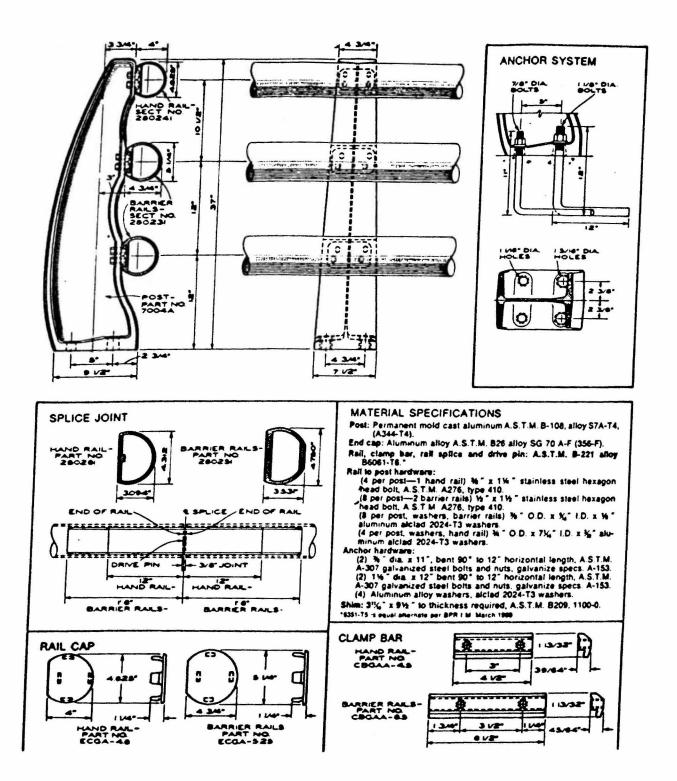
Aluminum Tri-Rail bridge rail with sidewalk.
